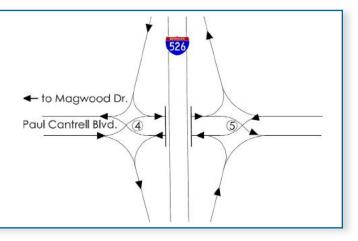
I-526 at Paul Cantrell Boulevard Alternative 3
